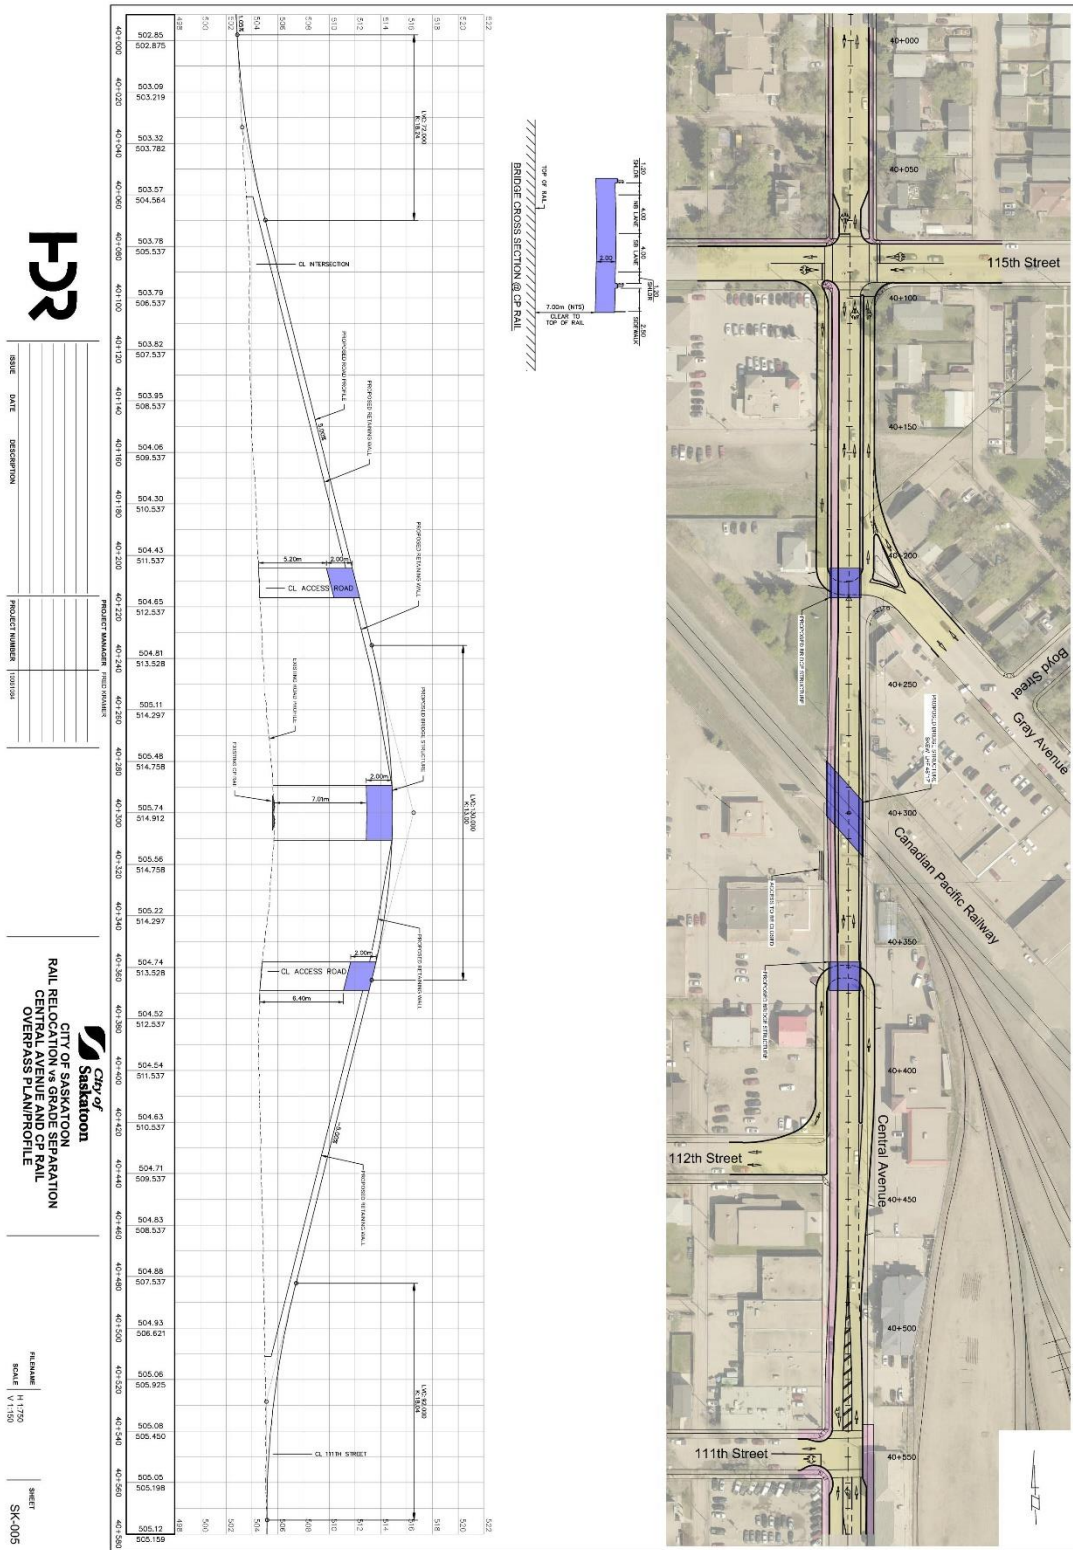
Proposed Conceptual Plan and Profile for Central Avenue @ CP
